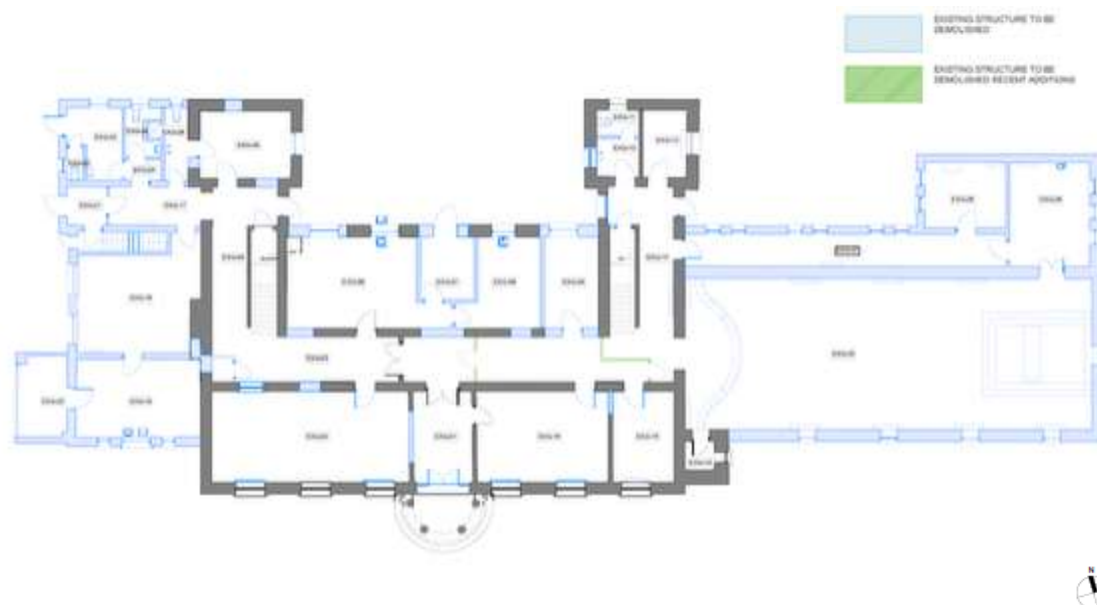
Ground floor plan of convent building showing room numbers and showing proposed demolition in blue
